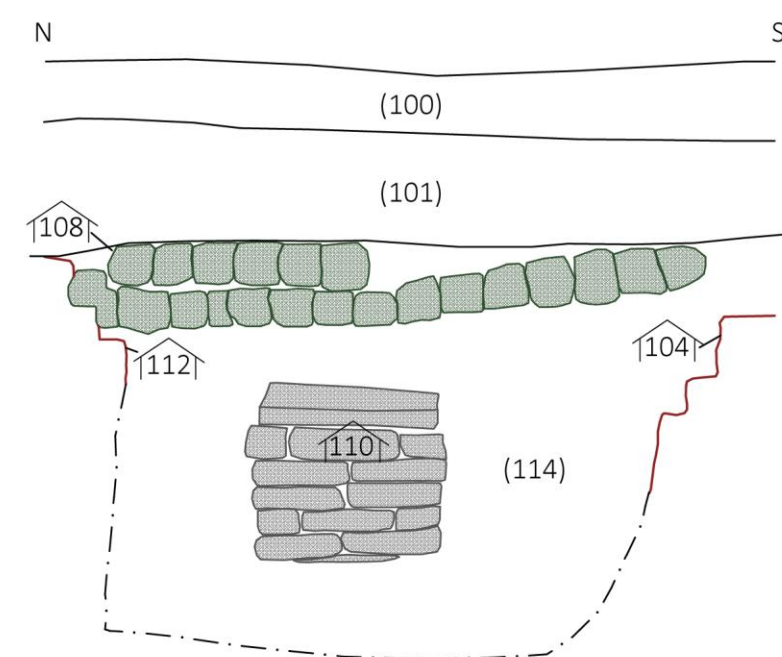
Brick wall [108] and possible inspection chamber [110], west facing section (scale 1:20)
